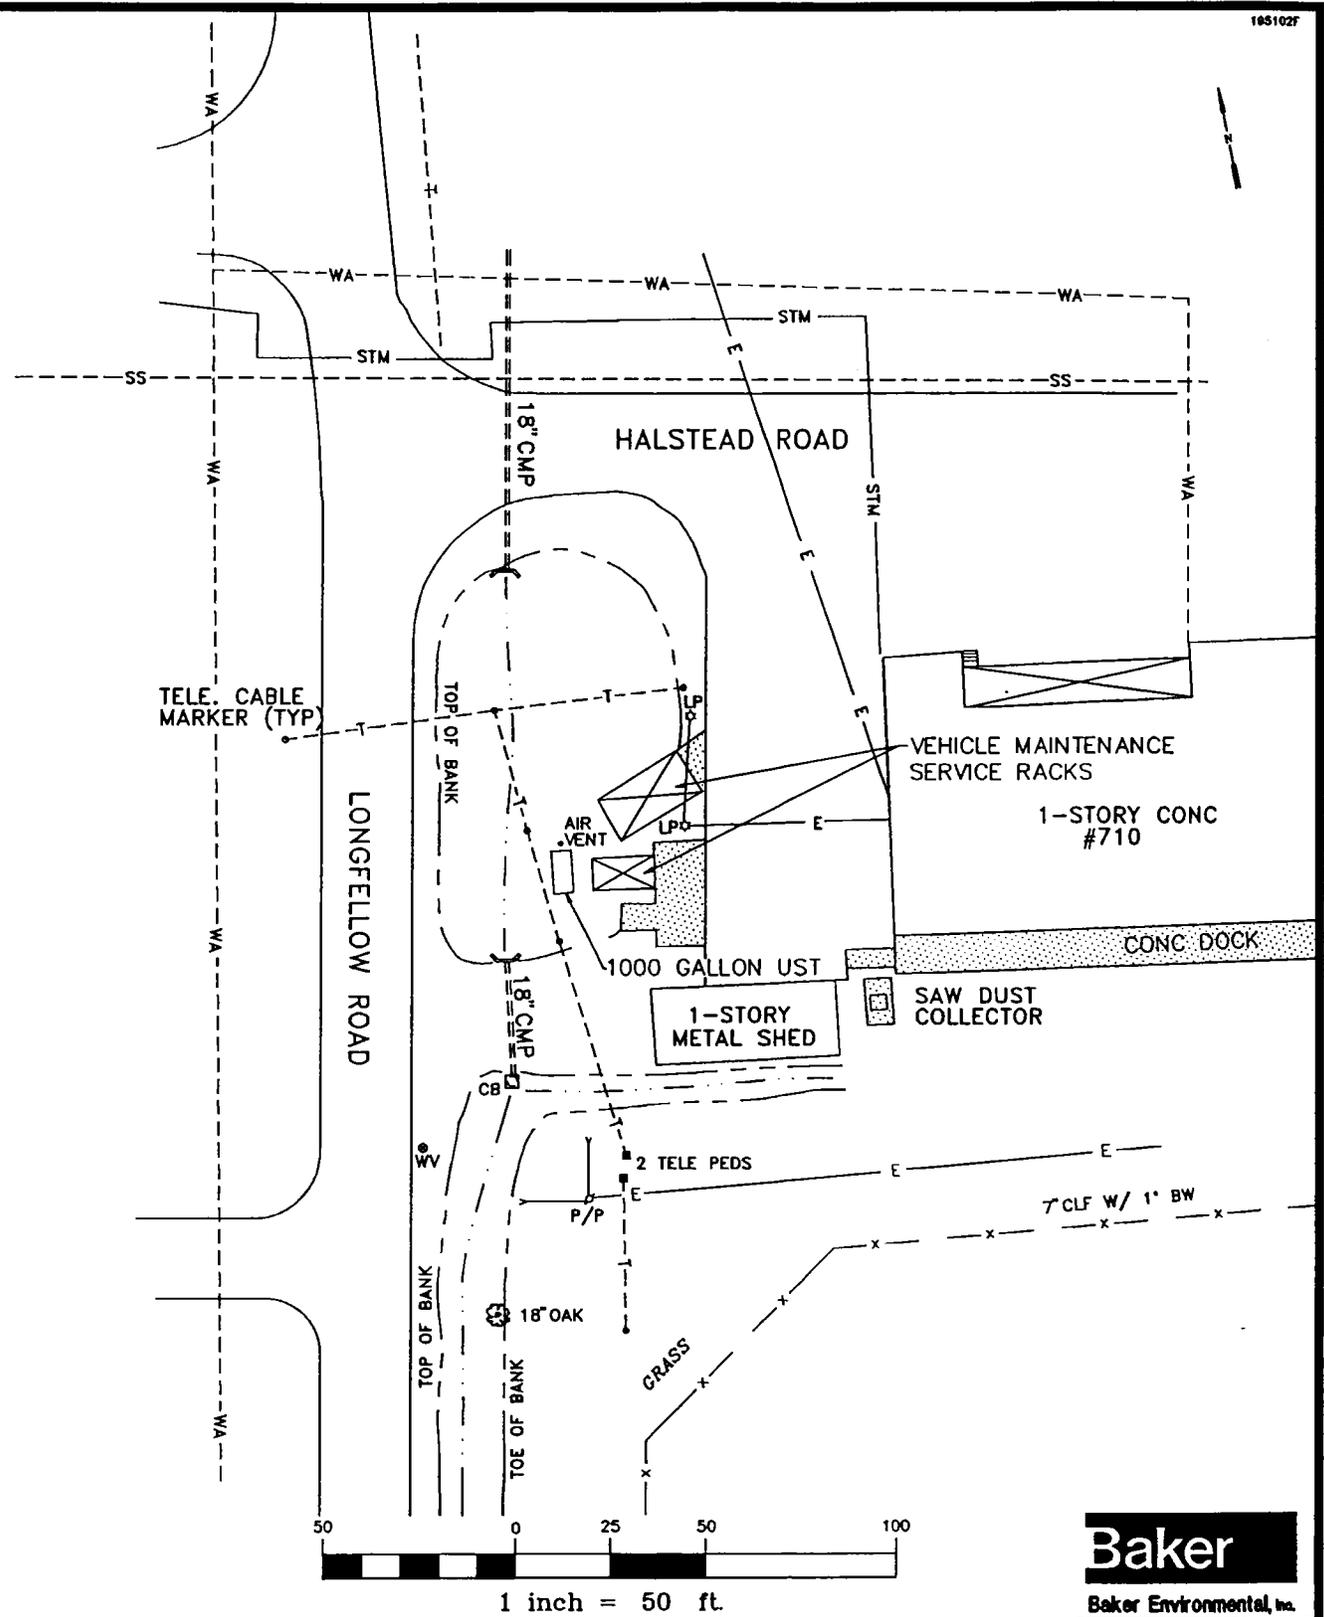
depicts a site plan for Building 710, showing the location of the vehicle maintenance racks, the UST system, the surrounding structures and utilities.
